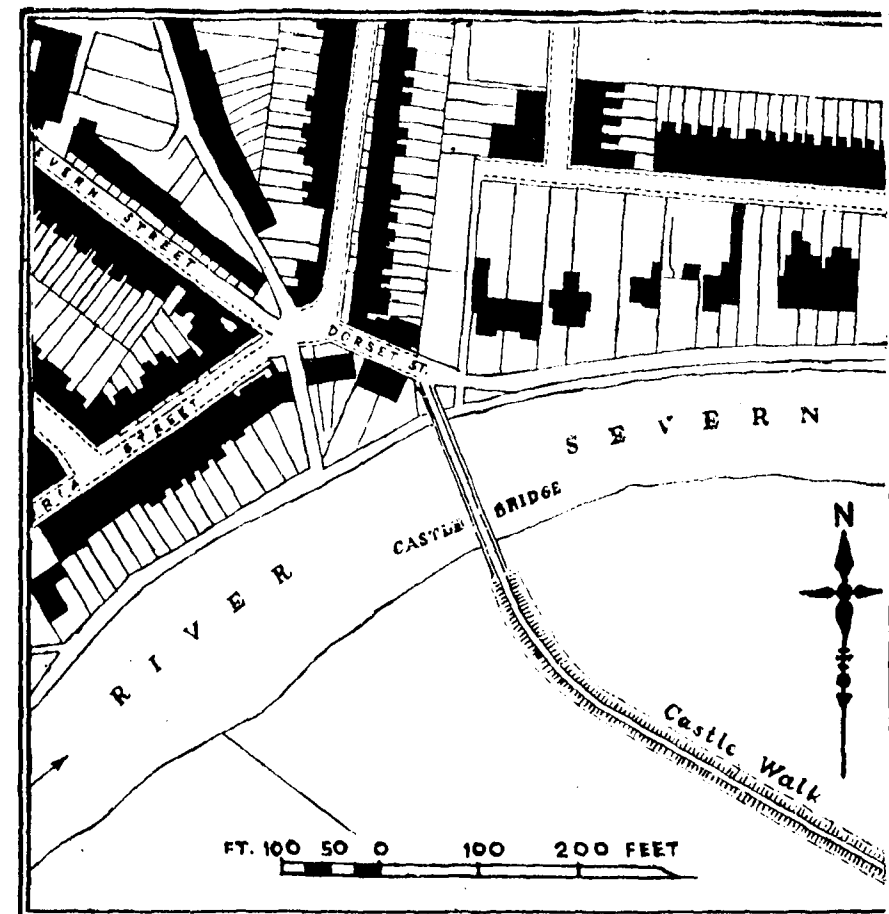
Site of the Castle Foot-bridge over the Severn.
